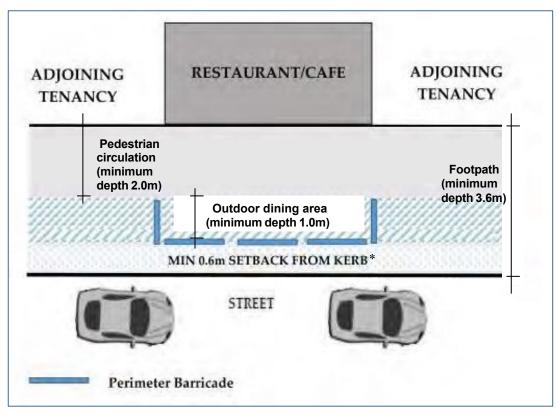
Minimum dimensions for outdoor dining on primary retail streets adjoining car parking.
